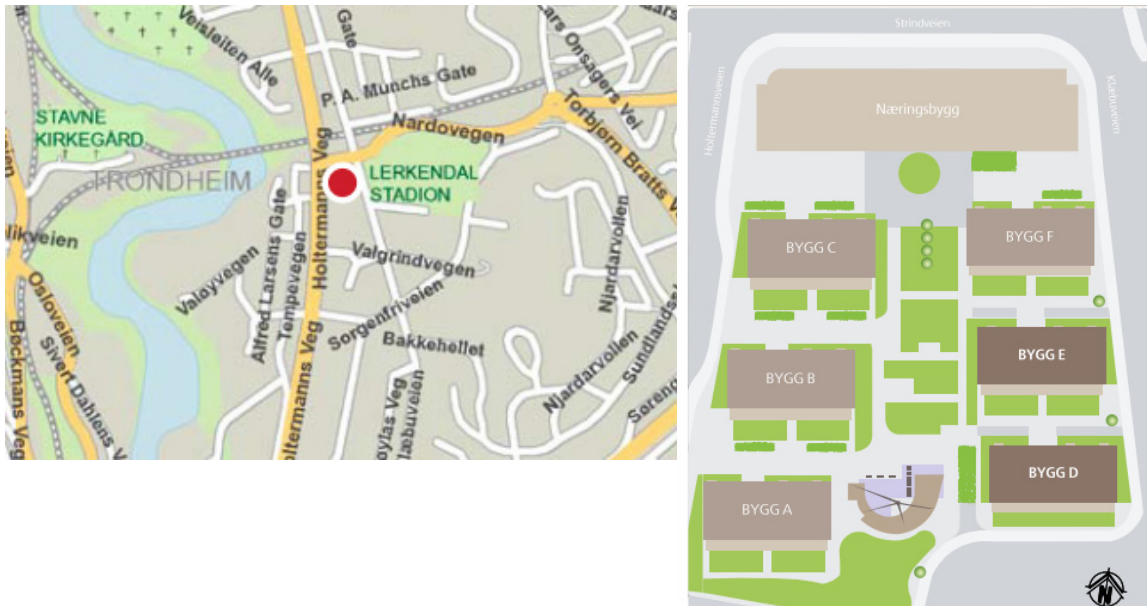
(left): Location of BoKlok construction site “Lerkendal Park” in Trondheim
